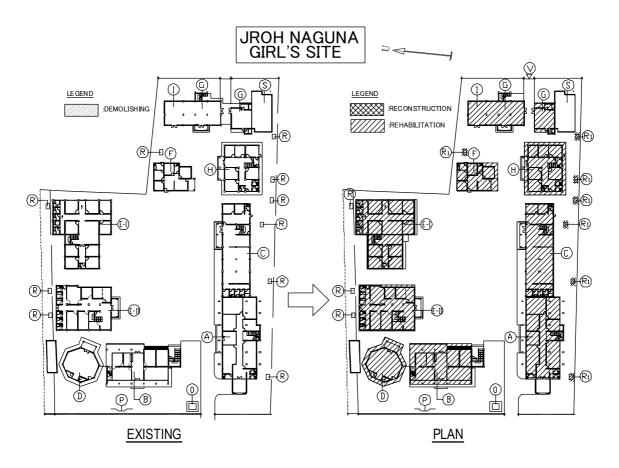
Site Plan and Rehabilitation Plan for Jroh Naguna Orphanage (Girl's Site)
